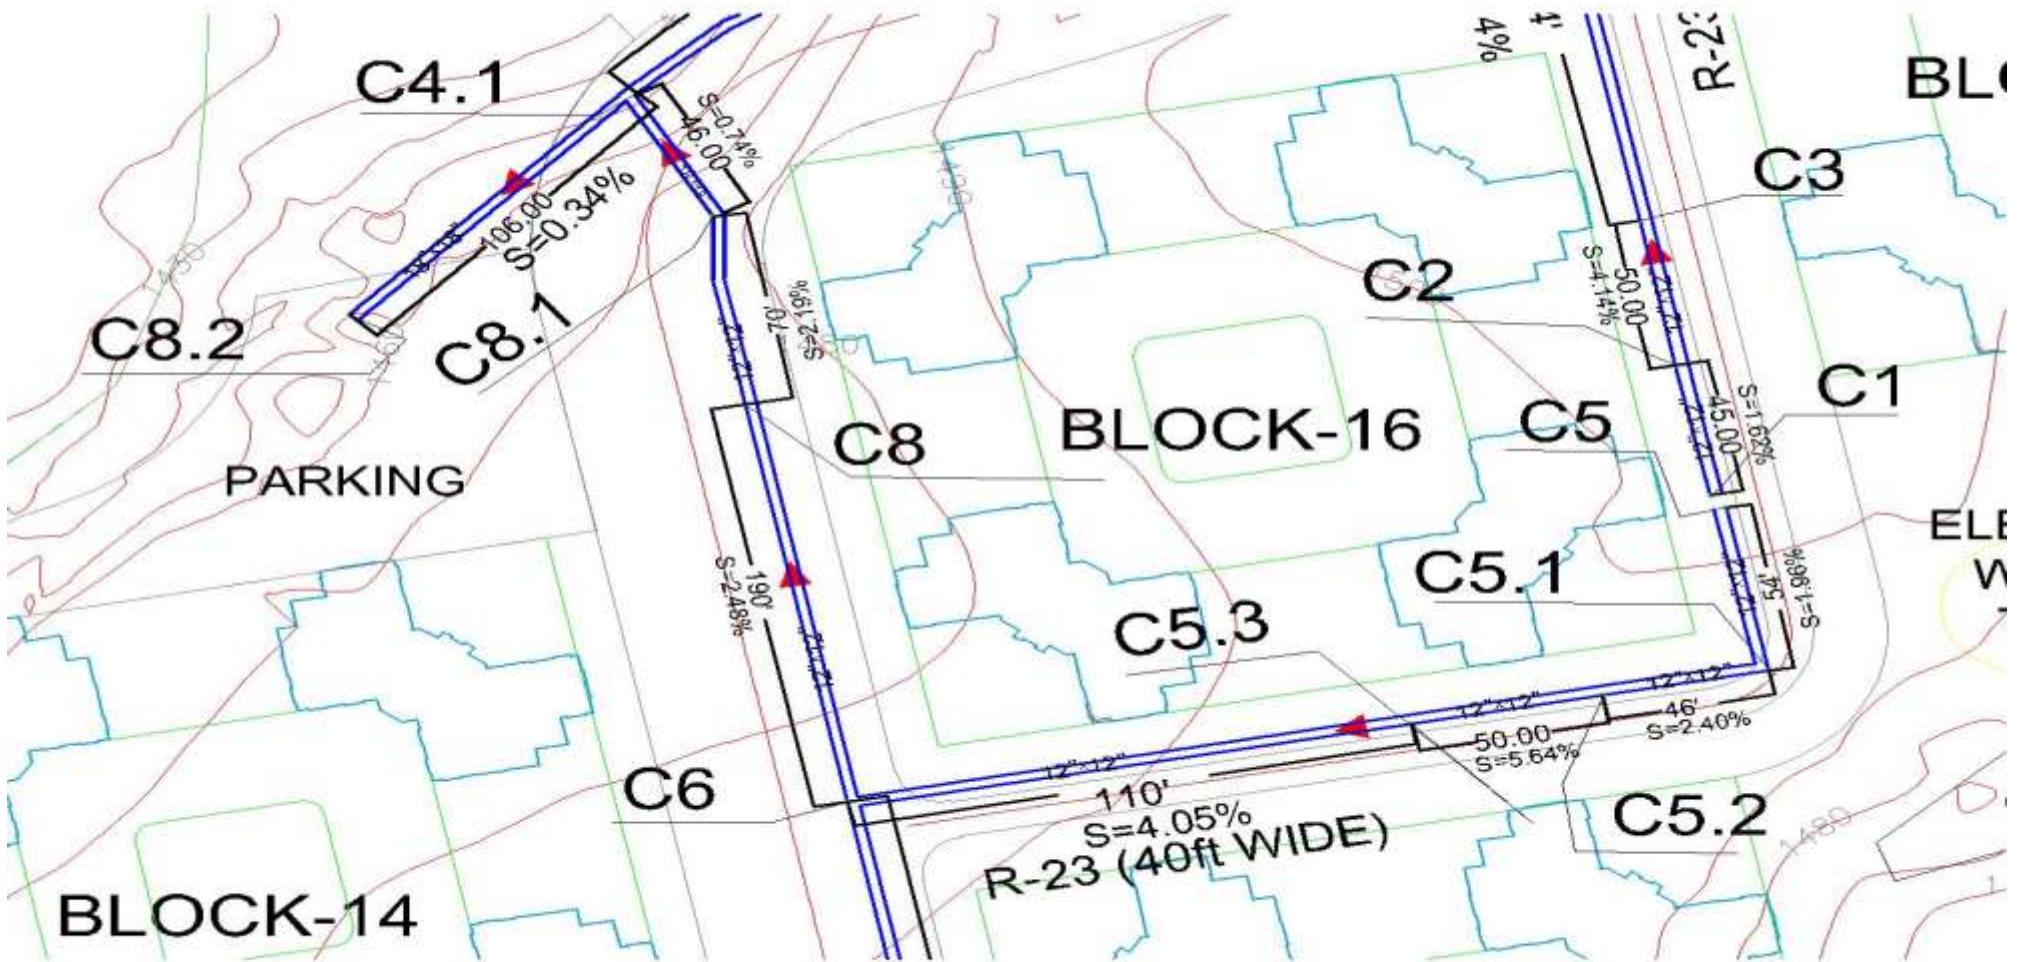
Storm drainage layout plan of Sub-catchment-13 showing final disposal node C8.2
